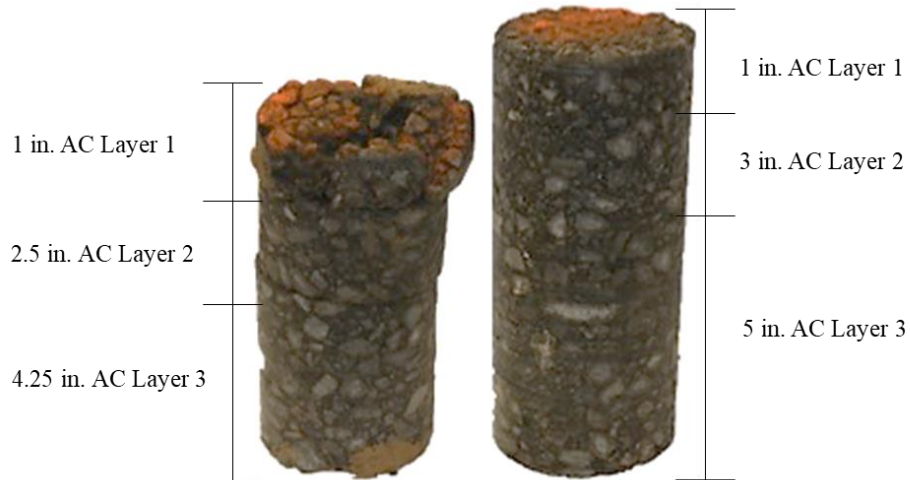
Photos of Cores Collected from a Distressed Location of a Pavement (left) and Non-Distressed Location (right) with Dimensions of each Asphalt Layer
